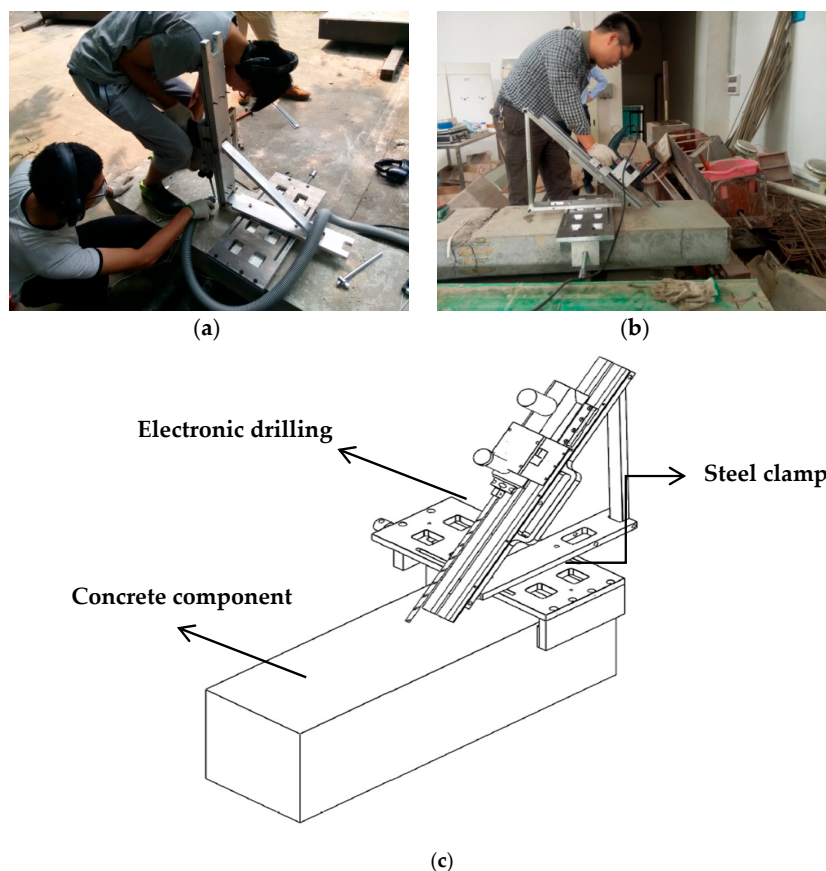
Details of invented drilling equipment: (a) Vertical drilling; (b) Inclined drilling; (c) Drilling equipment.
